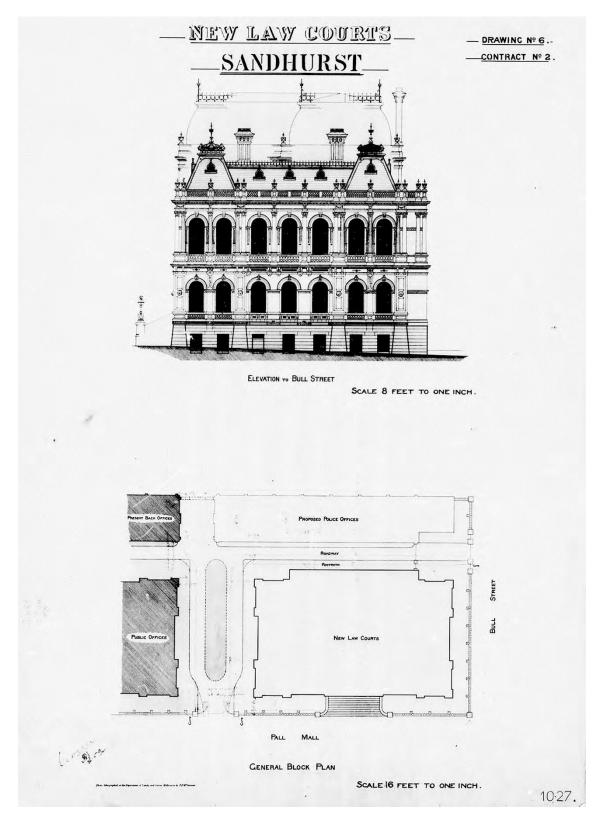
New Law Courts Sandhurst, Drawing No. 6, Contract No. 2 Source: Public Works Department, PROV LCB 10.27
